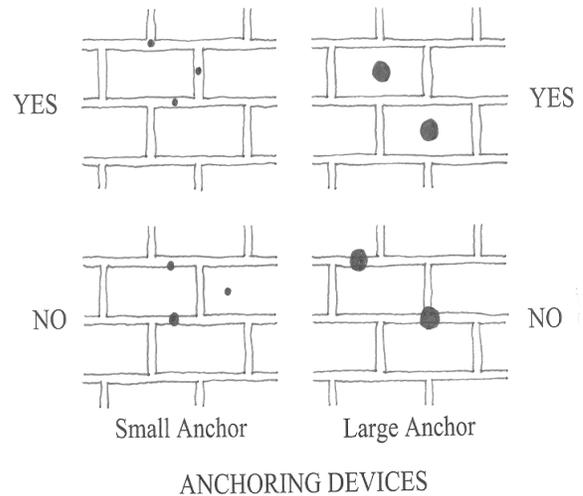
Anchoring devices for the support of signs and other wall-mounted items should be anchored with minimal damage to historic wall materials. In masonry walls, small anchors should be inserted in the mortar joints, while large anchors should be held back from the mortar joint, not overlapping the joint.
